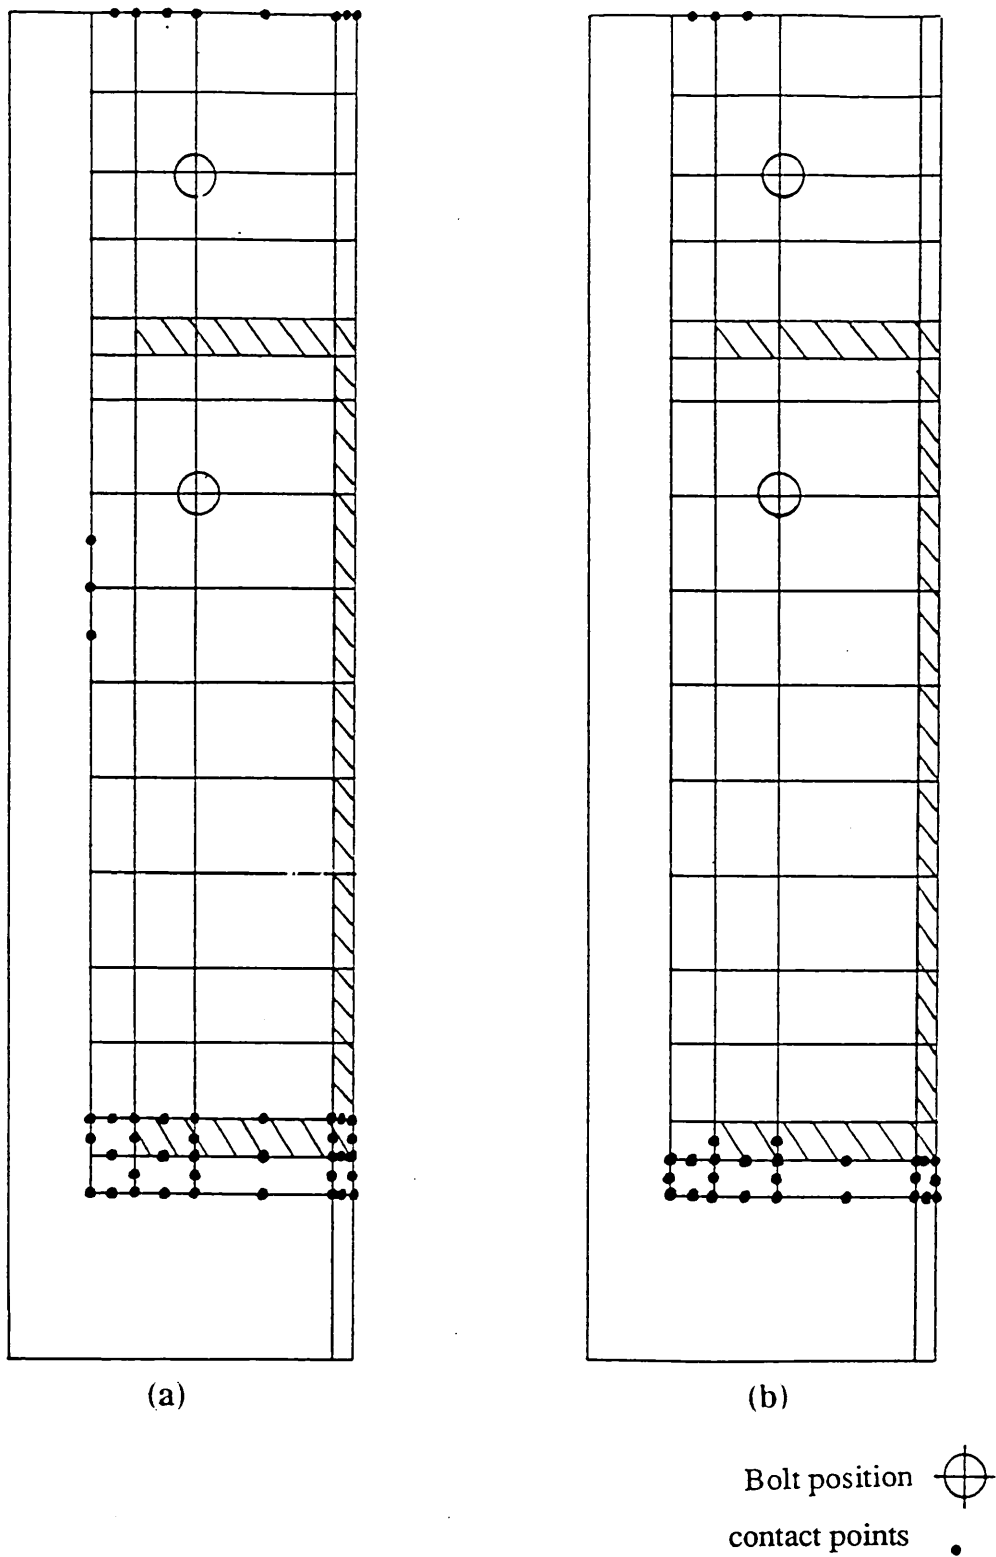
Prying pattern for 15mm end plate connection when the column and bolts are infinitely rigid (first set)
